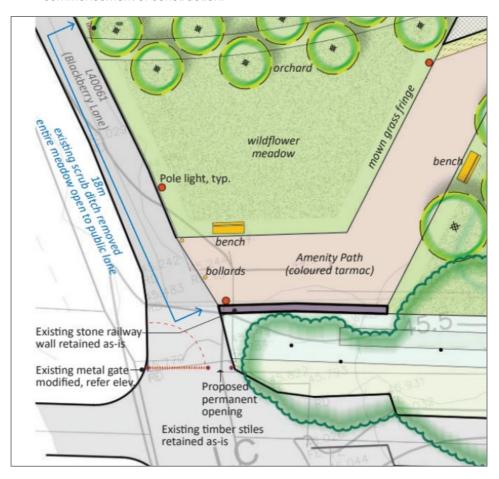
Extract from Landscape Plan on Proposed Arrangement to Southwest
